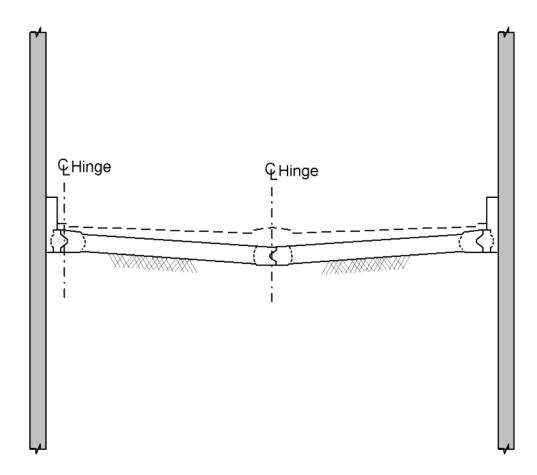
Hinged slab : A406 North Circular Road, London
